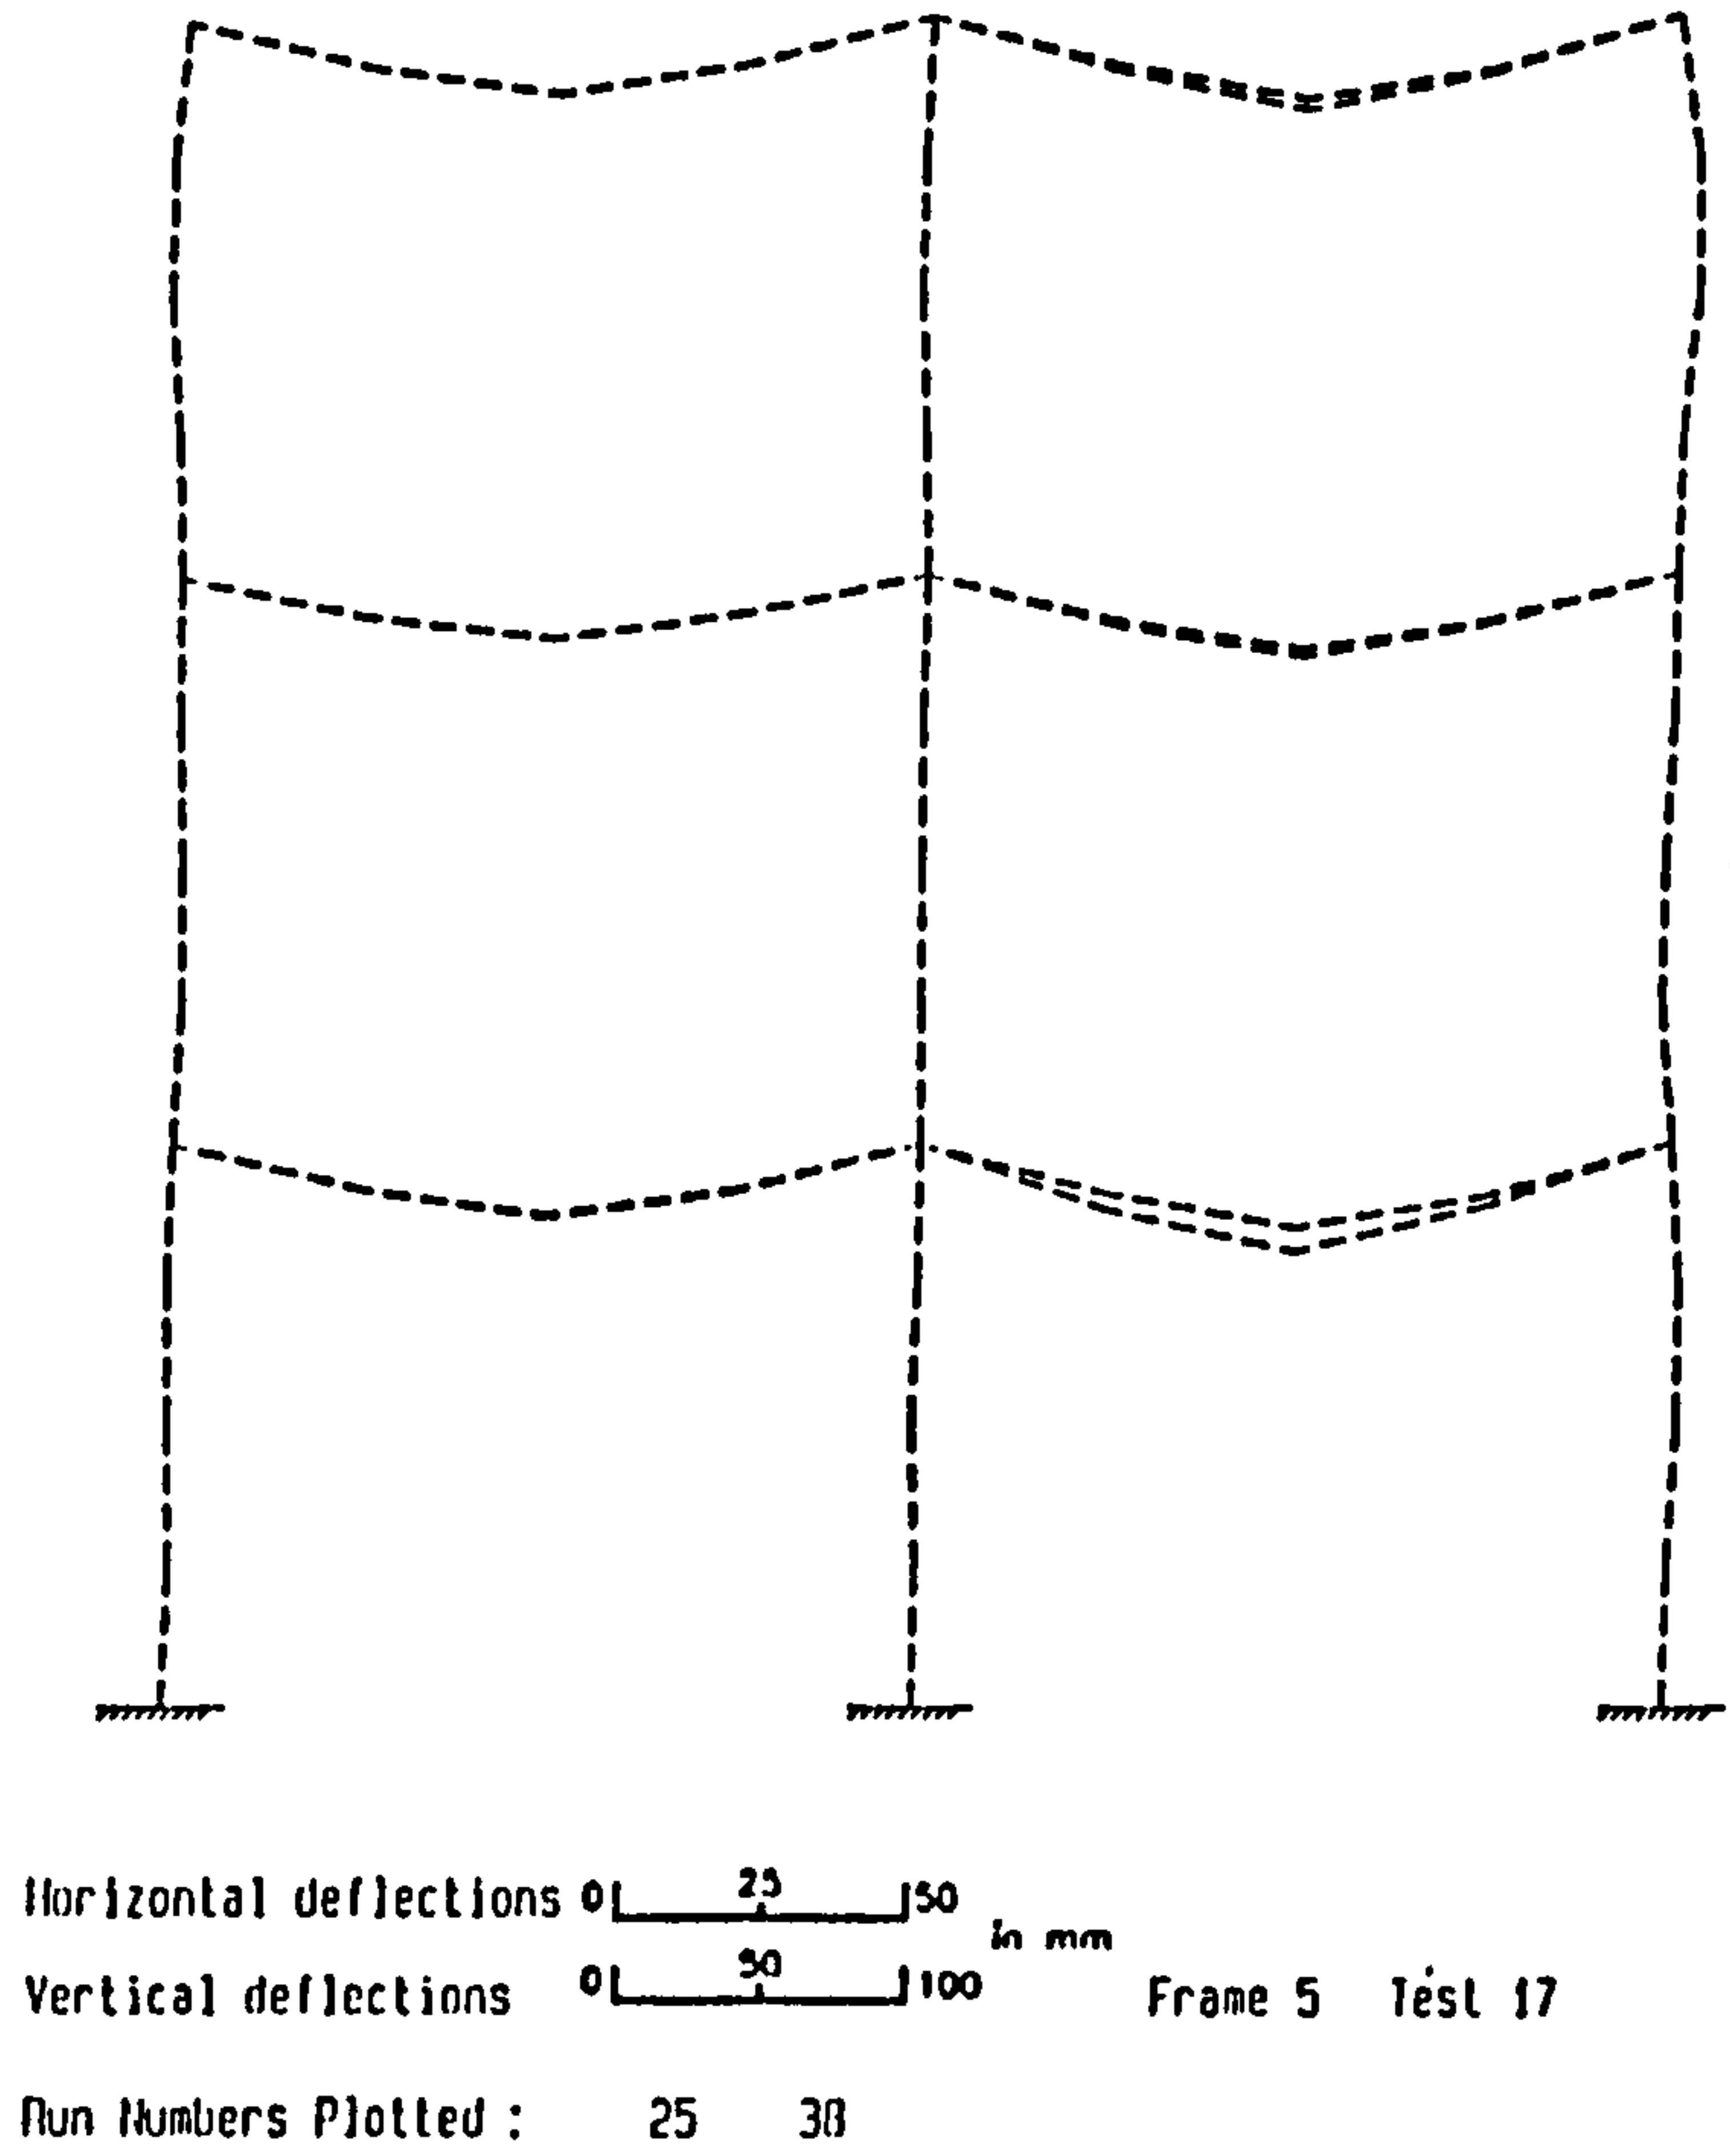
Frame Deformation around the Frame in Test 17 of Frame 5 in the End of the Beam Load and Failure of the Central Column
